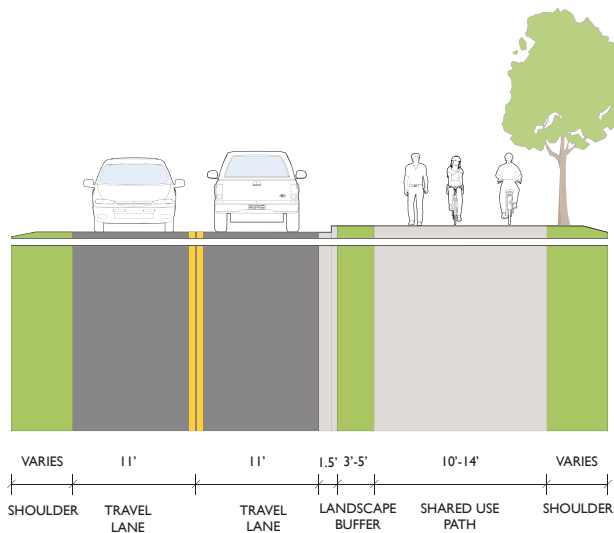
Section B - Hillcrest Dr (Shared Use Path with Minimum Separation)
